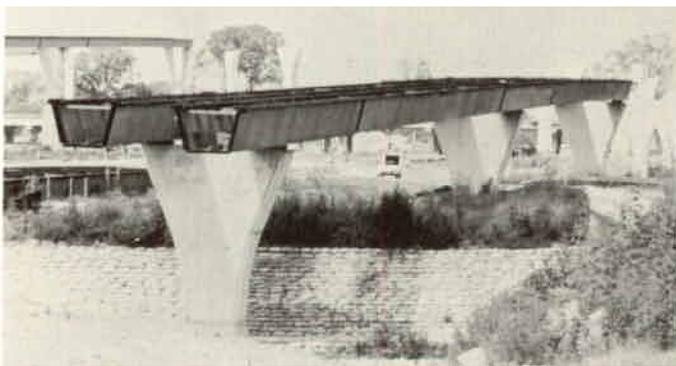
Louisiana Airline Highway Interchange: erected sections of straight-box girders.
